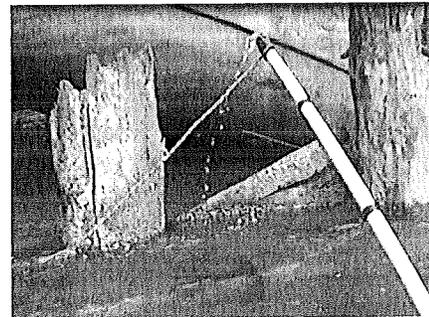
South fender system, typical broken pile in poor condition in the tidal zone, missing bracing and poor walers looking northeast.
